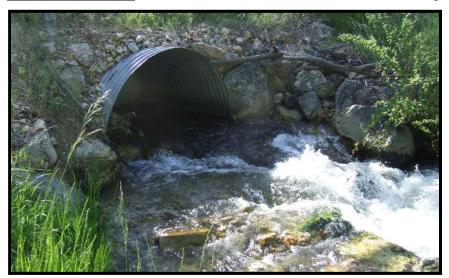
Under-sized culvert on Sioux Lane across Tower Creek was a partial barrier to fish passage.
